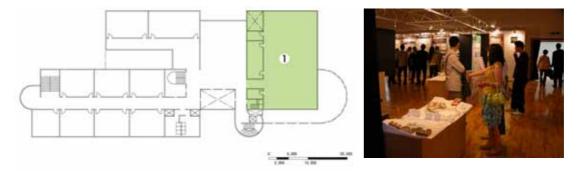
Natural Science Building Key Plan: Exhibition Room
